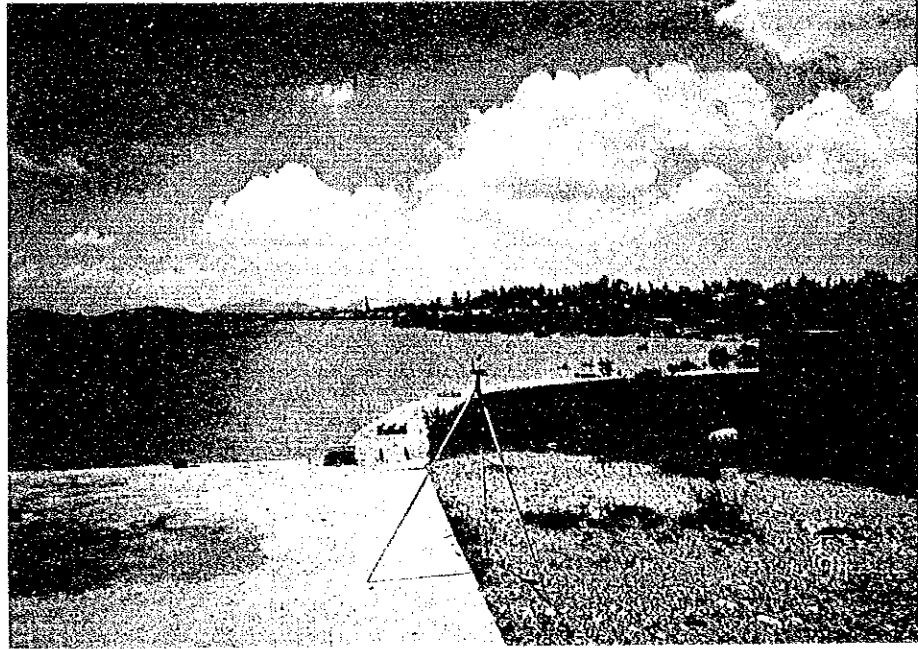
Present River Bank of Dinh River in front of the Project Site "Cat Lo"
